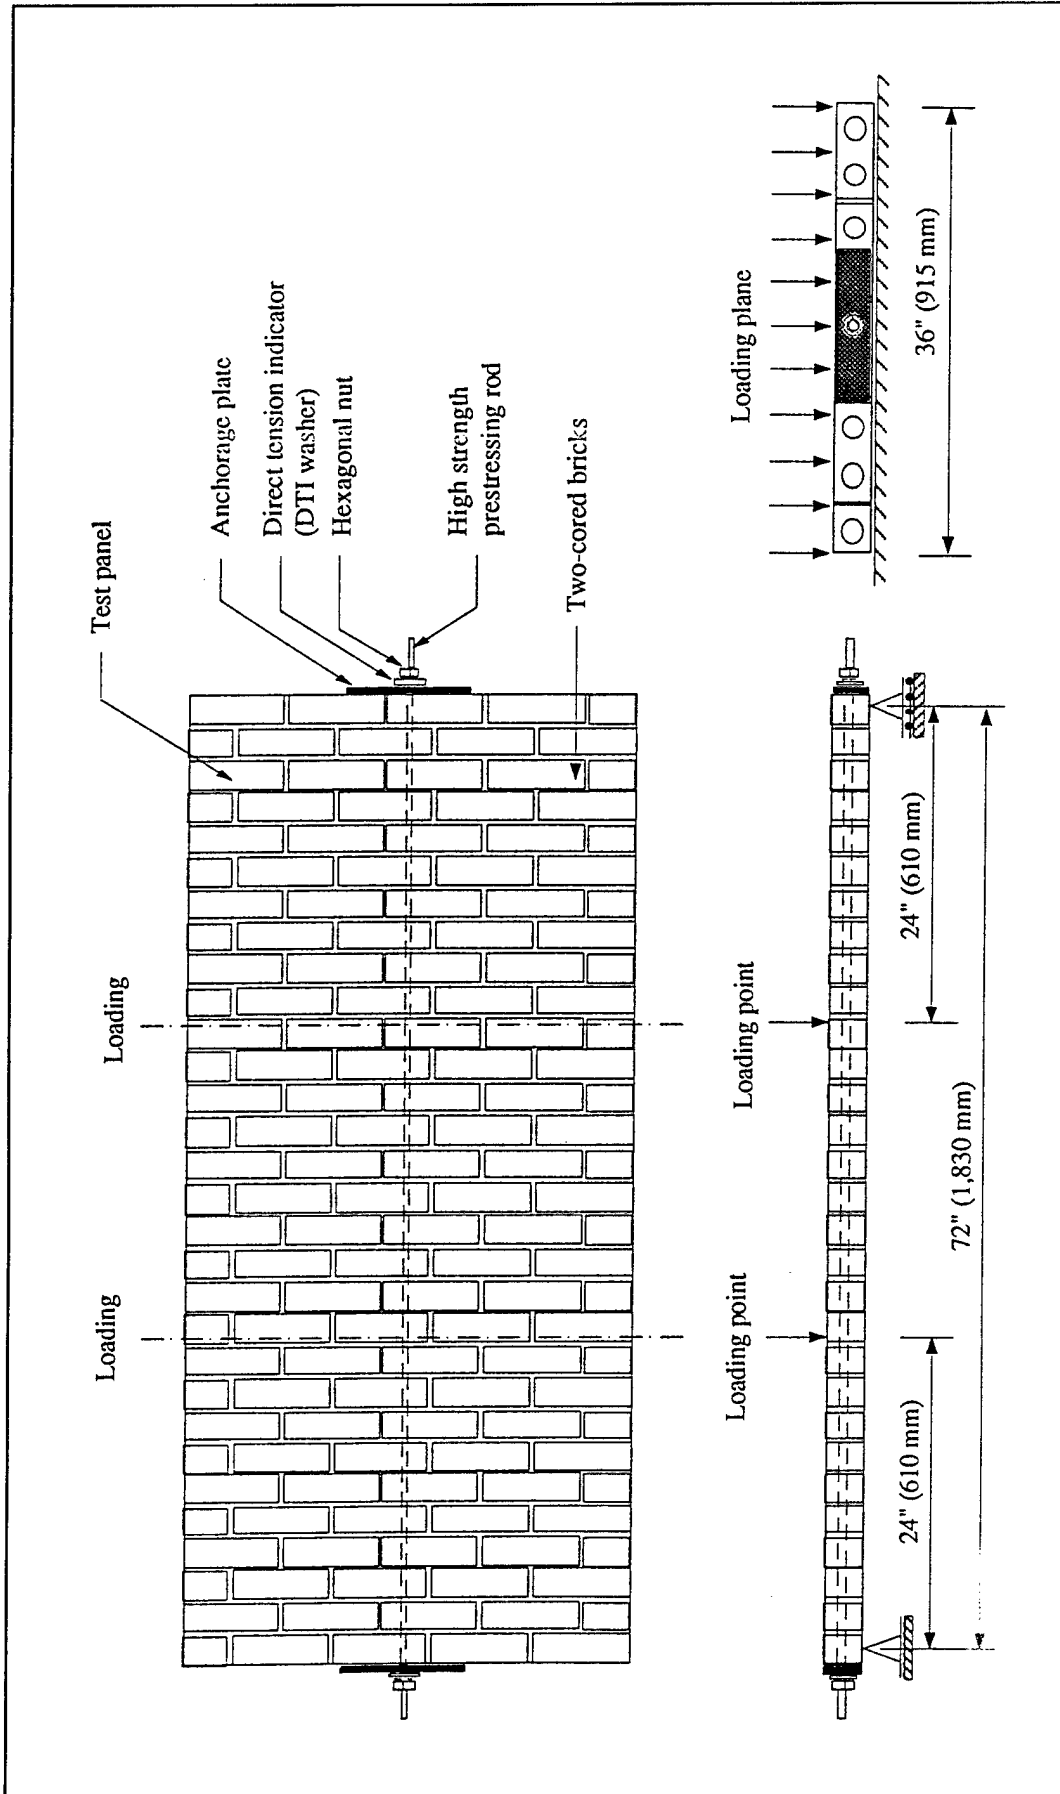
Typical detail of a post-tensioned test specimen for out-of-plane loading.
